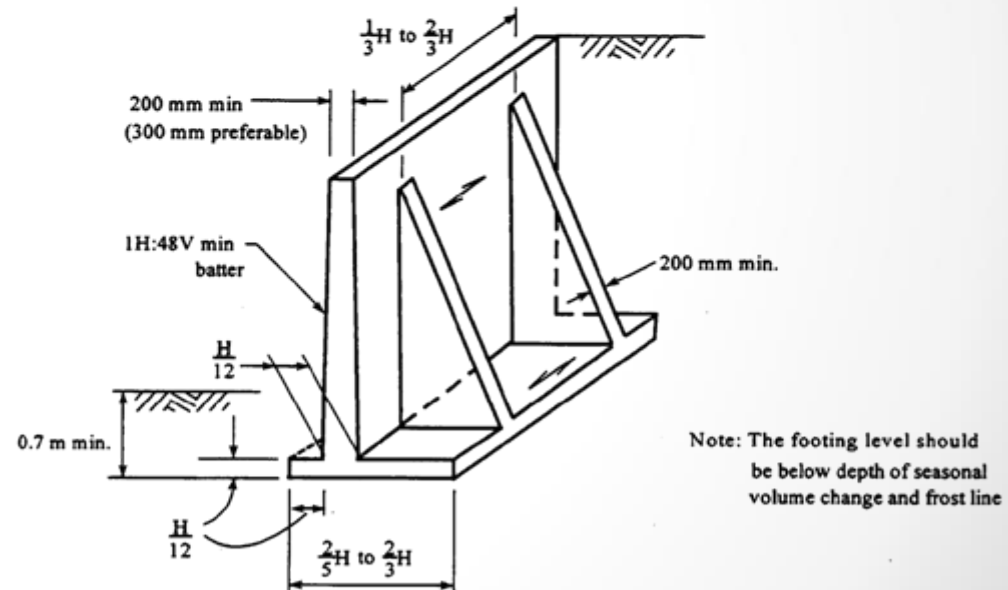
Design criteria for cast-in-place (CIP) Concrete retaining walls (after NAVFAC, 1986b).
